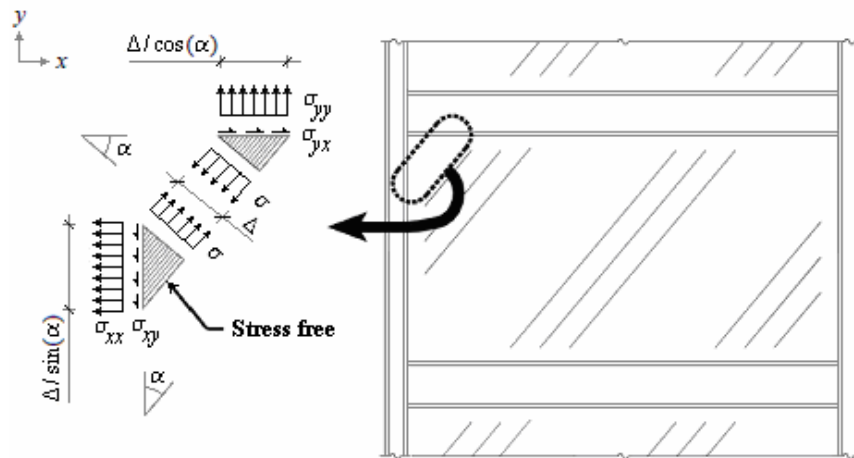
Details of stresses imposed on SPSW boundary frame members (Sabelli and Bruneau, 2006)
